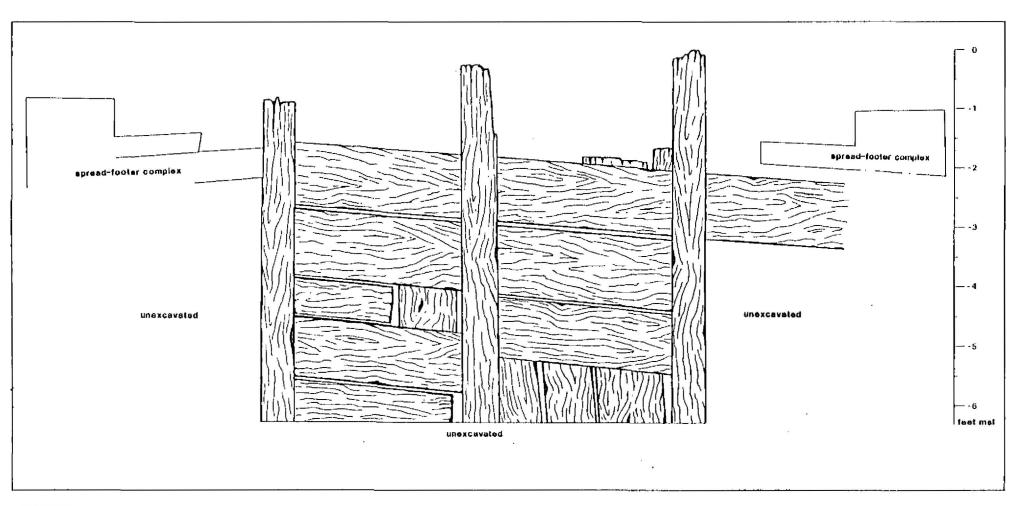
Profile, west wall of Backhoe Trench J, Sections 3 and 4, in Lot 25, showing east face of plank bulkhead.
